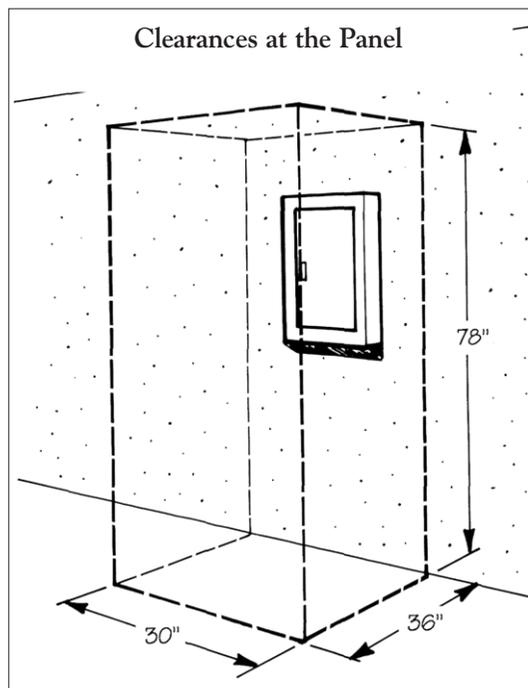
Panel placement. For a 200-amp or smaller panel, code requires 3 feet of clear space in front of the panel, 30 inches wide, and extending from the floor to a height of 6 feet 6 inches. No pipes or ducts may cross this space. In addition, the door of the panel must be able to open at least 90 degrees.
